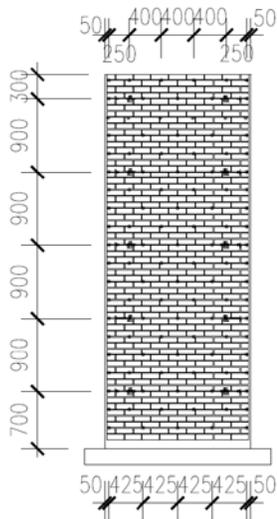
Elevation of brick ties and horizontal HK4 bracket on masonry wall B Fig. 12: Detail of brick ties and horizontal HK4 bracket on masonry wall B
